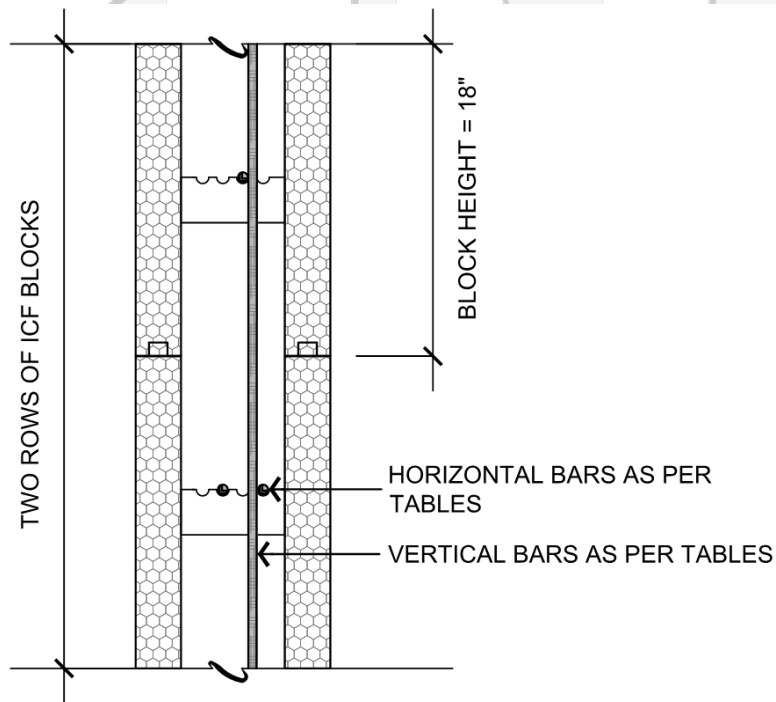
Above Grade Wall Reinforcing Placement for 12" Thick Walls.
